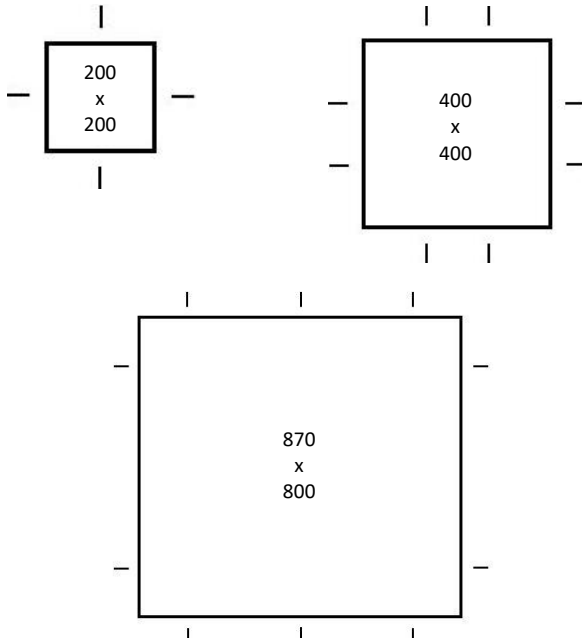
Examples of fixing lug number and positioning for installation frame type ER-A1
